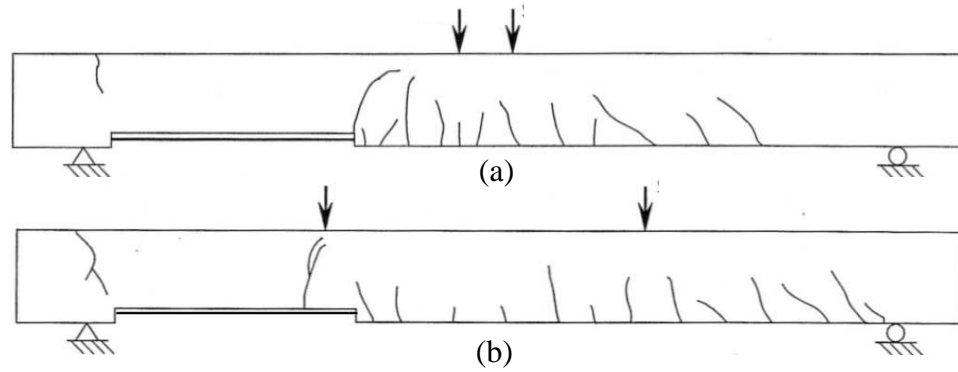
Loading and Cracking Patterns for (a) Specimen Configuration 3, and (b) Specimen Configuration 4 (Raof and Lin 1997).
